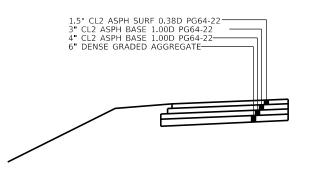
/ BLAIR BRANCH PAVEMENT DESIGN
